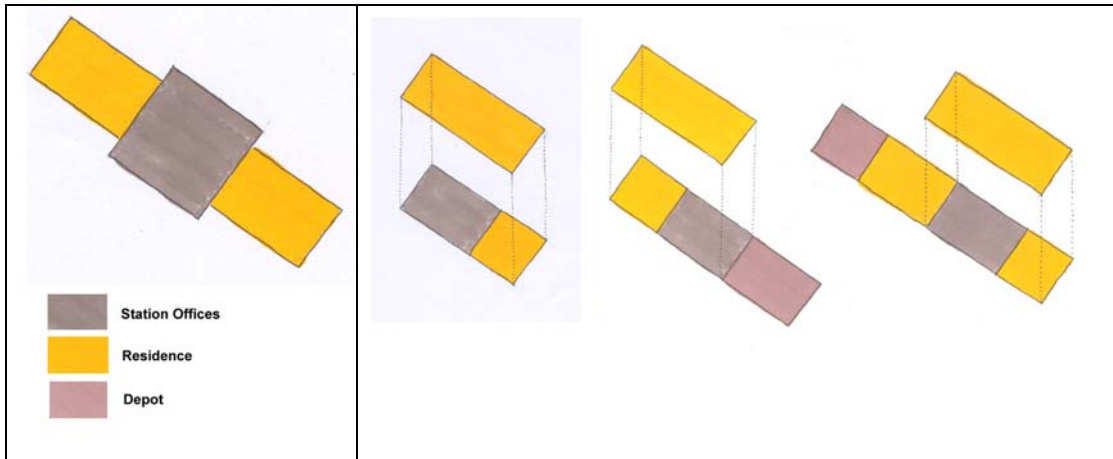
Plan diagrams of the main station buildings. Left one shows the single storey building, right ones shows the two storey buildings.
